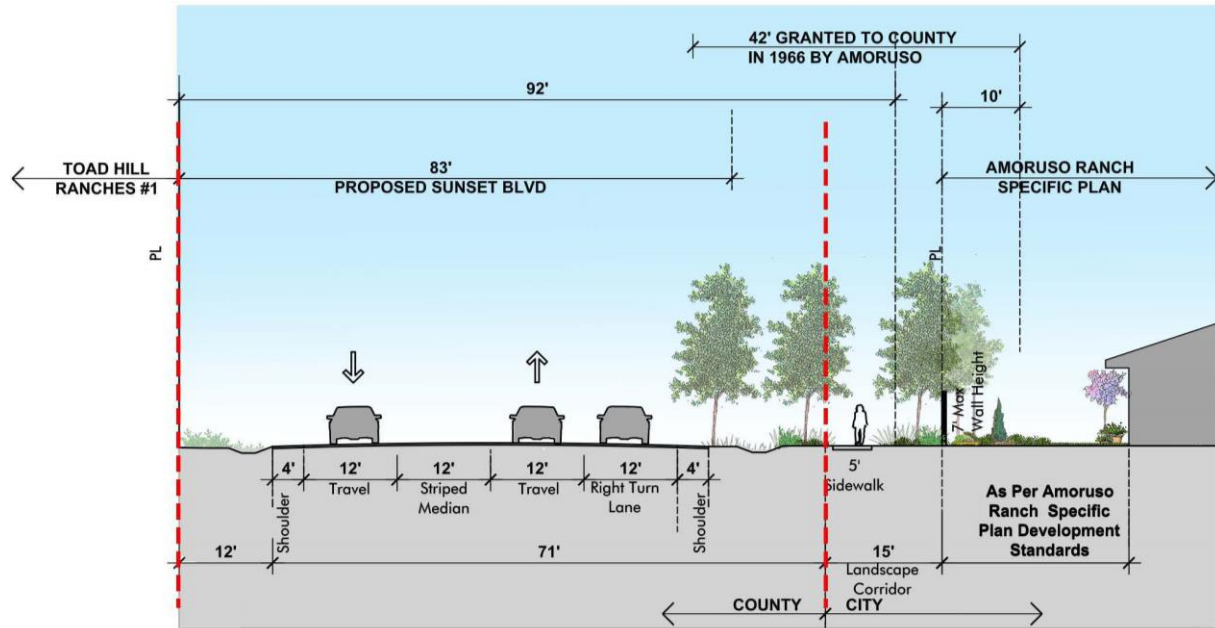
West Sunset Boulevard with Right Turn Lane Section 2-2
